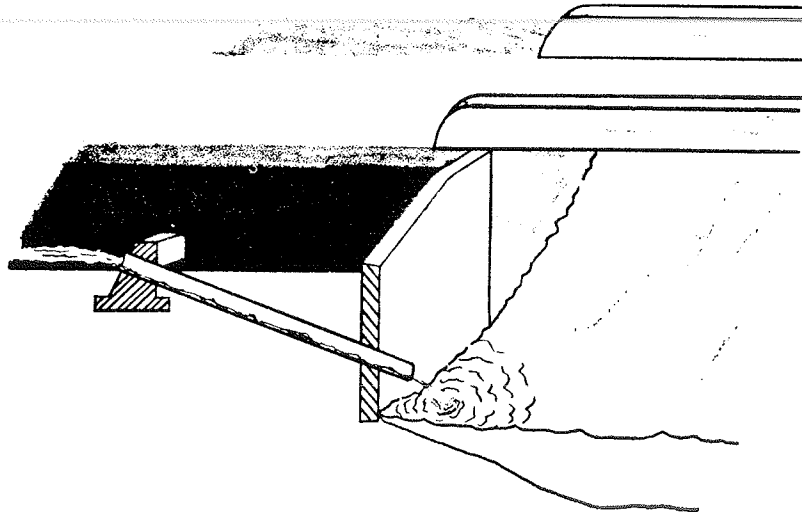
A straight pipe may be used to outlet a ditch where the drop is too steep to maintain a sluice without erosion.
